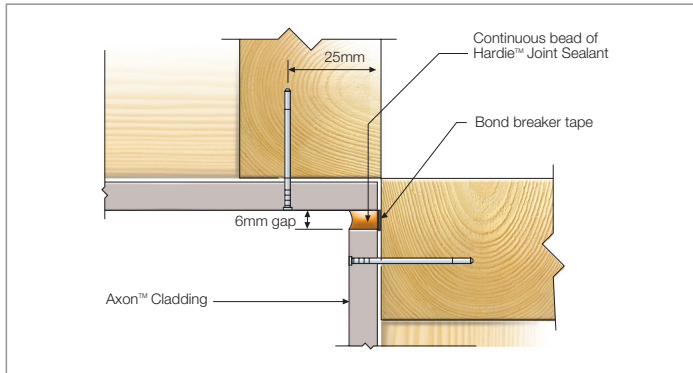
INTERNAL CORNER - SEALANT FILL
